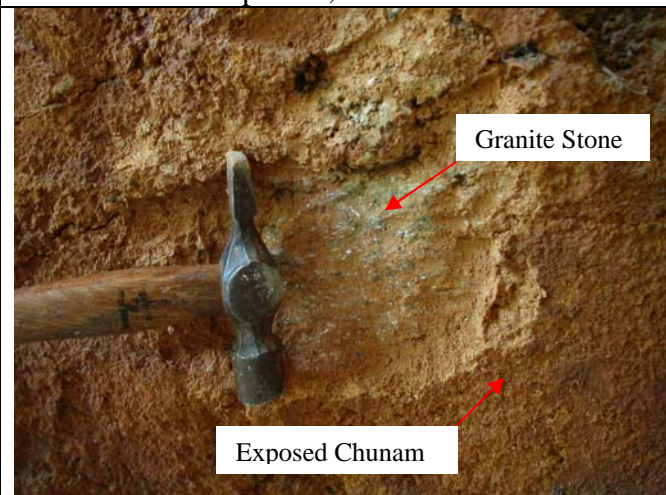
Exposed Chunam mortar at external wall and granite stone can be seen.
